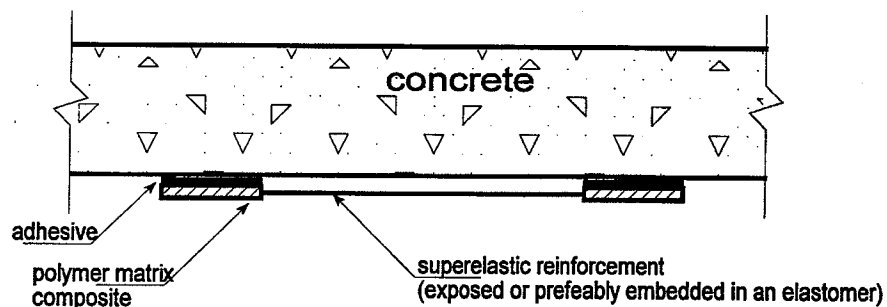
Crack Opening and Closure in Superelastic Reinforced Beam
